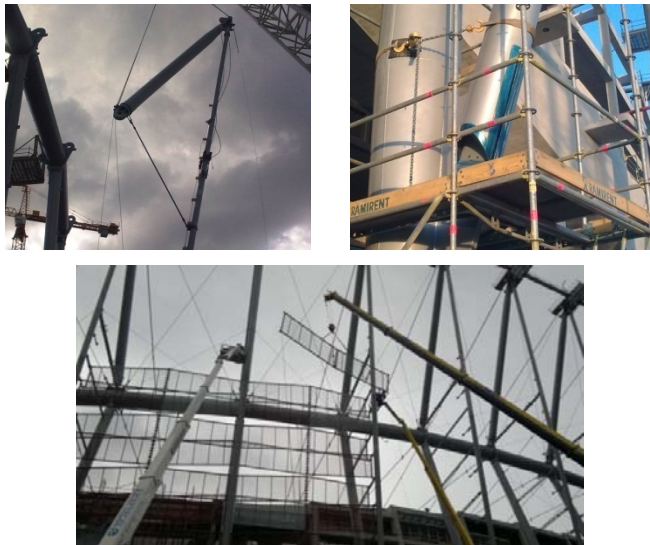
A brace with stay ready for a bolt connection and bottom of the stay ready for welding; assembly of façade panels, stays stiffened by connections with poles
